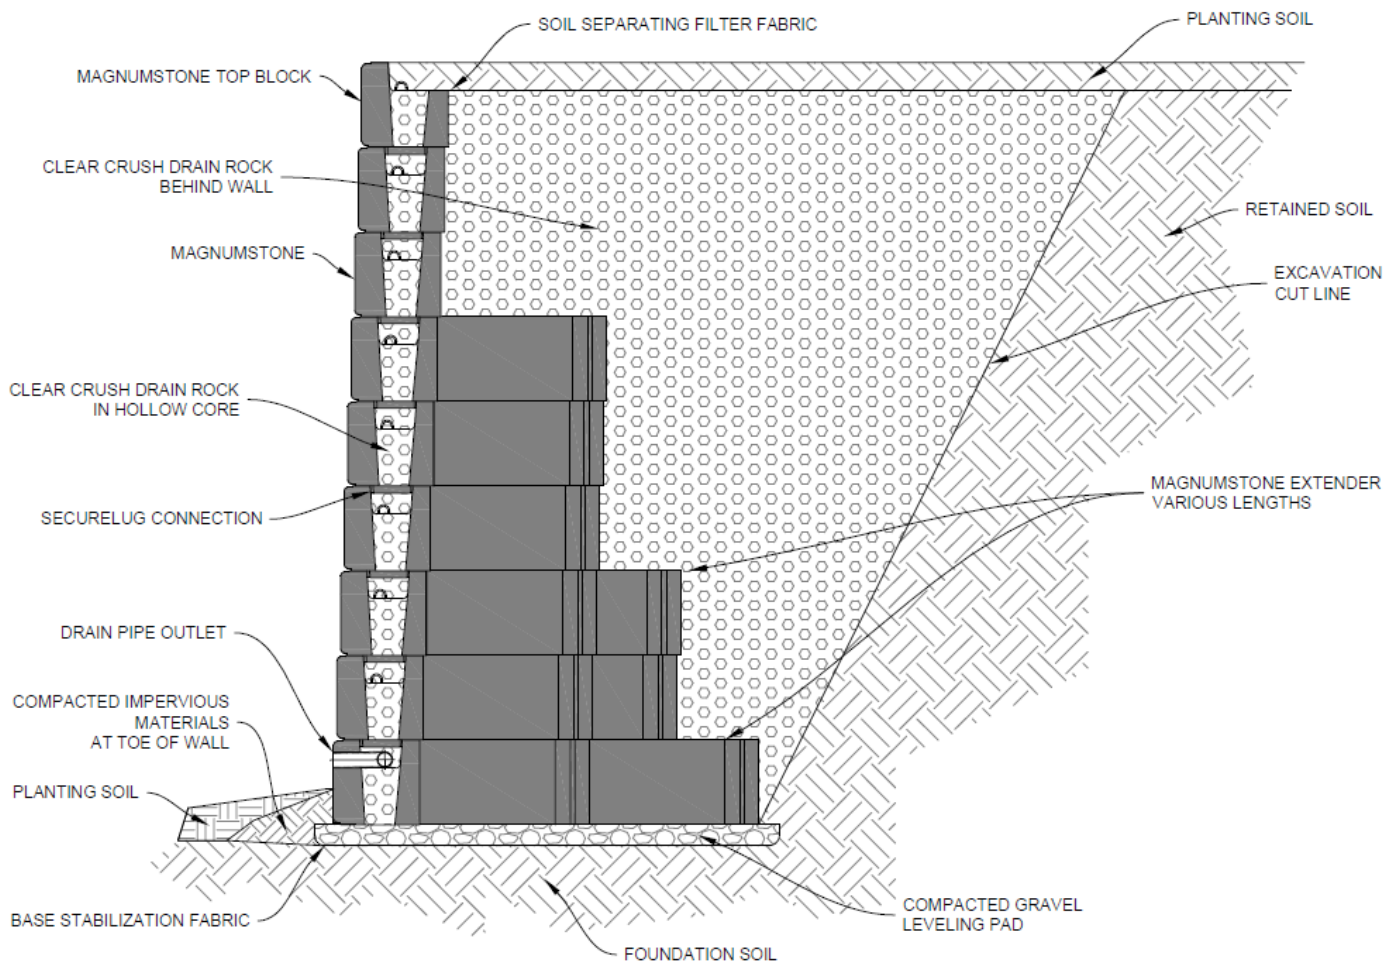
GRAVITY RETAINING WALL WITH EXTENDERS
